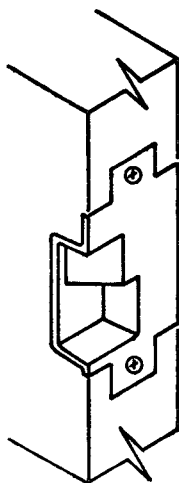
Typical "open-back" latch strike for pairs of doors, installed in edge of inactive leaf when permitted by individual published listings.
